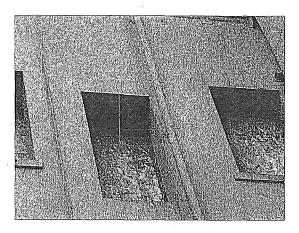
Detail view of punched openings. Note cracked cement plaster between window lintels (photograph taken on 01/26/2018).
